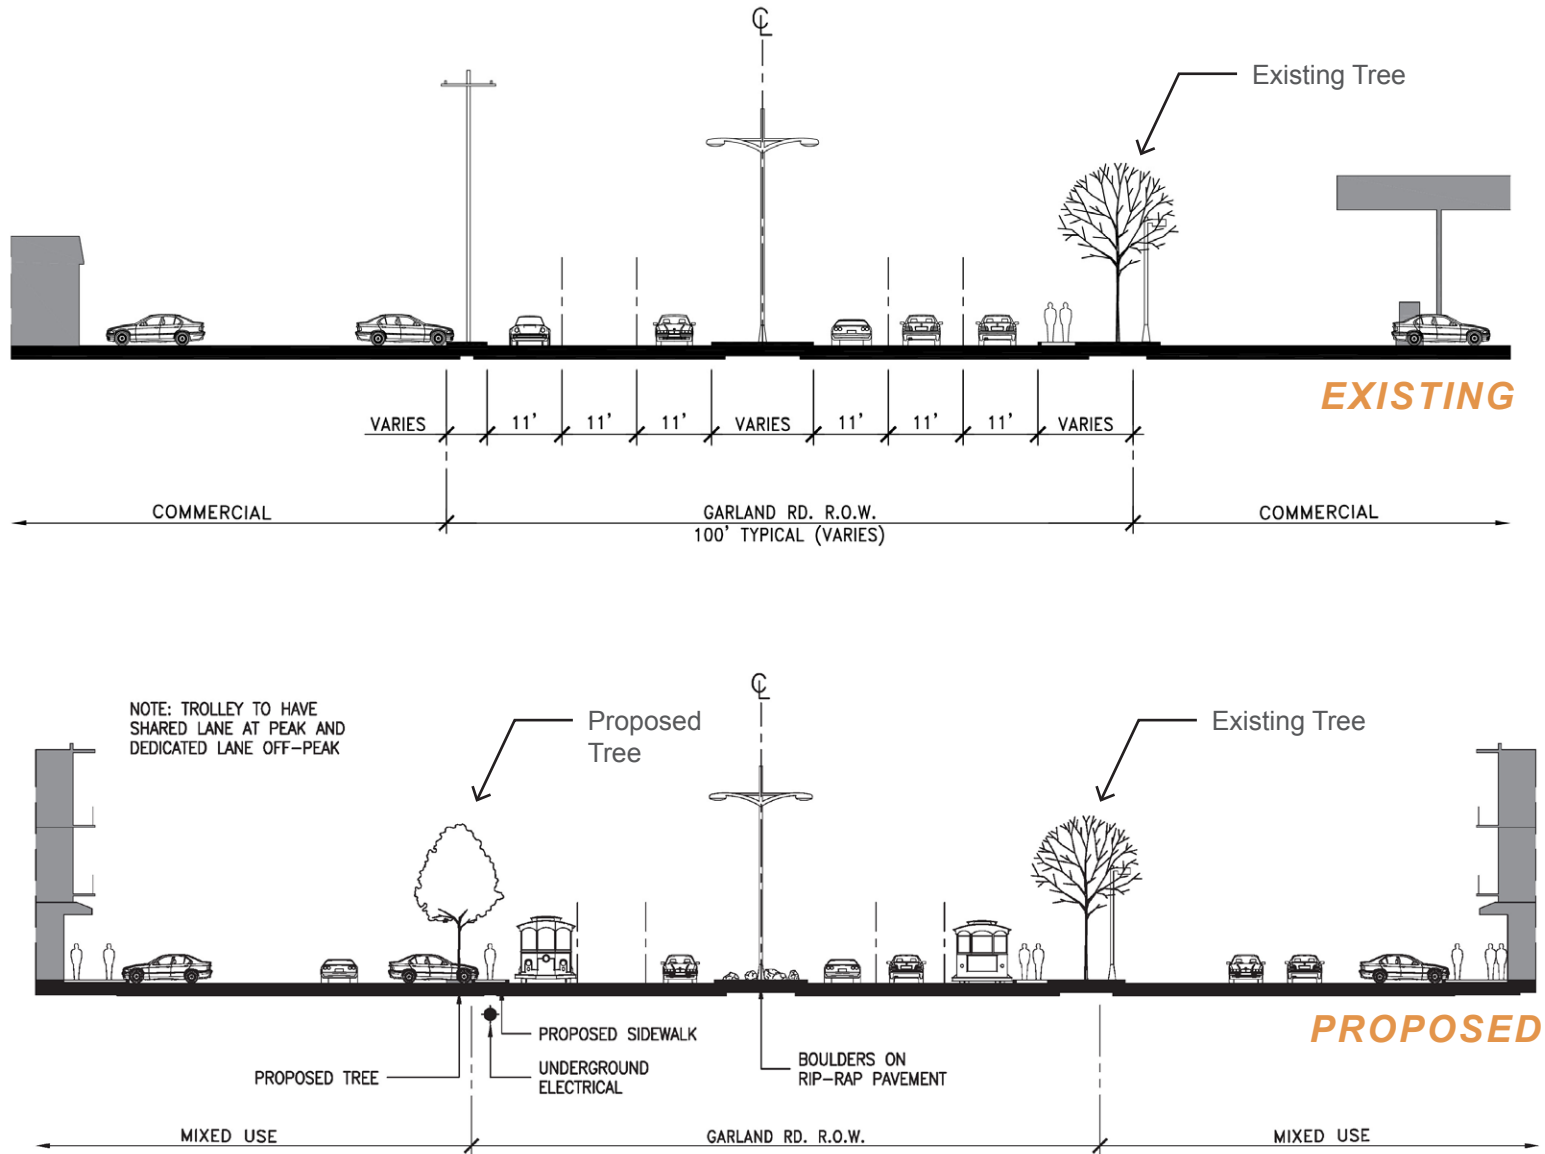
Section B: Garland Road at the Dallas Arboretum and Botanical Garden
